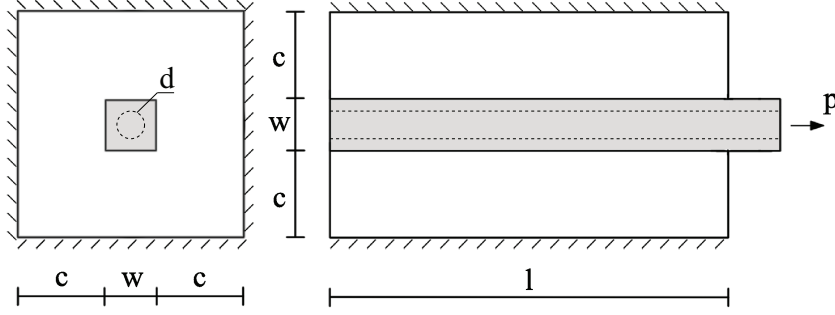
Cuboid test specimen for a smoothed rebar placed in unreinforced concrete.
